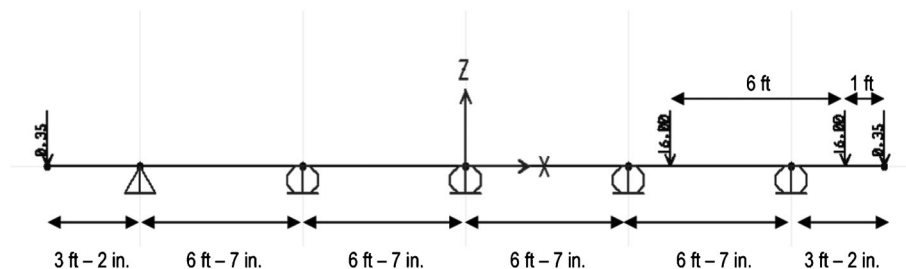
Elevation View of Bridge Deck Model + Loading
